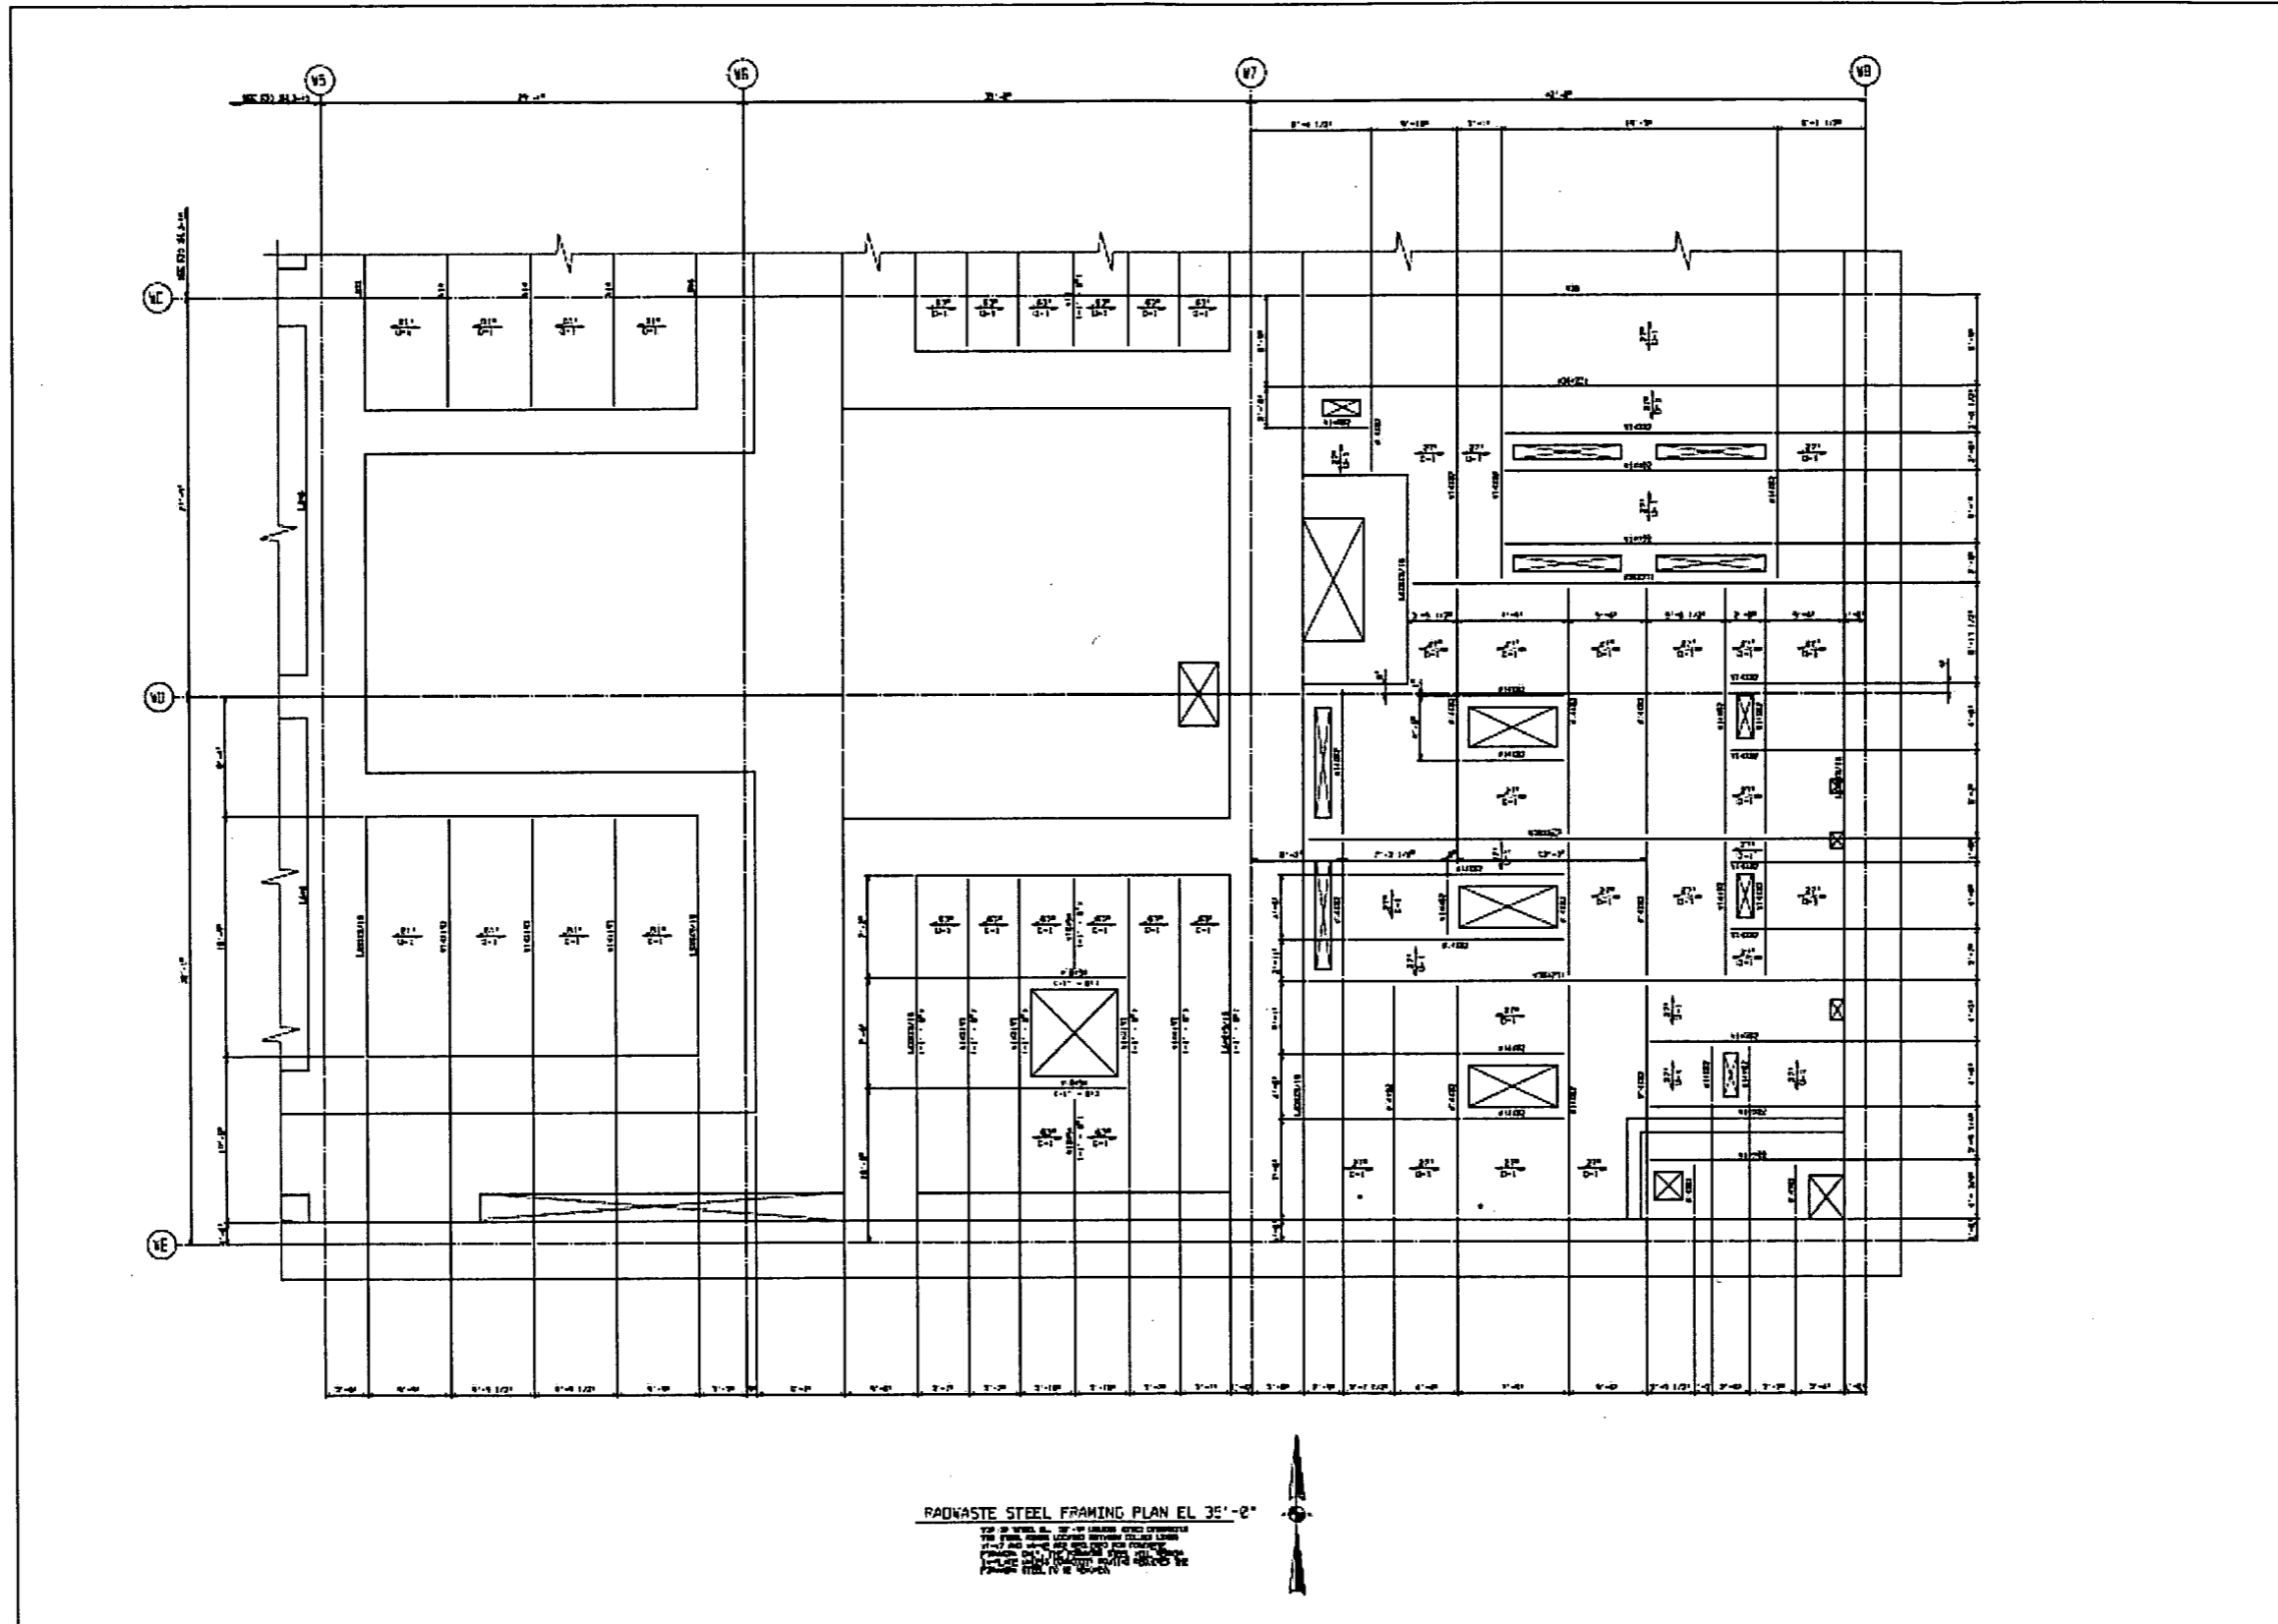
H.3-46 EL 35'-0" STEEL LAYOUT BETWEEN COLUMN LINES W5-W8 AND WC-WE
